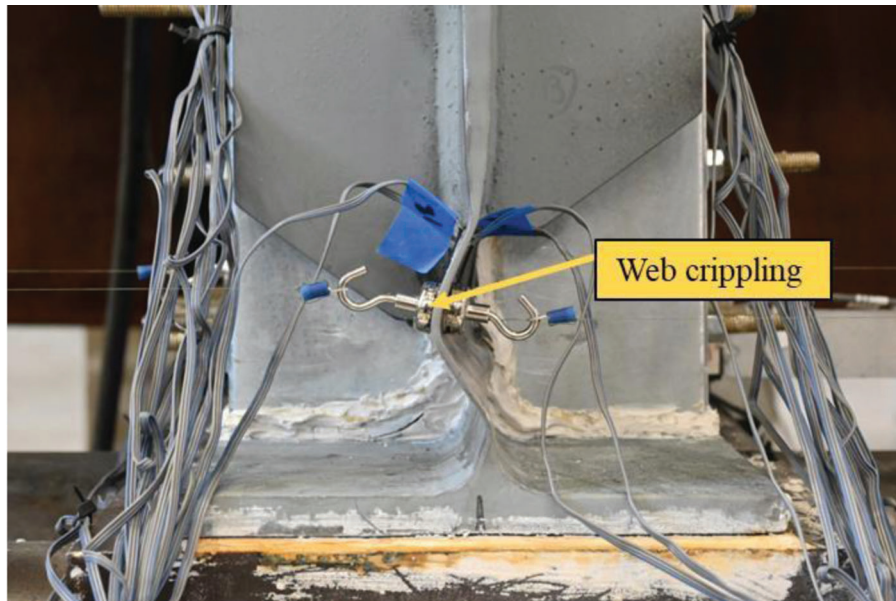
Specimen 5: deformed shape, enlarged front view.
